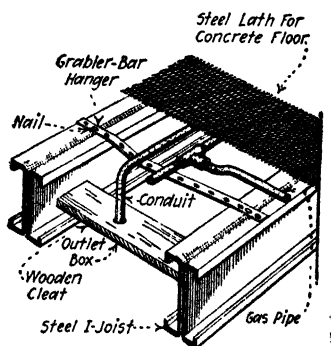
Ceiling outlet in "lumber" steel floor slab where concrete floor is to be used.
